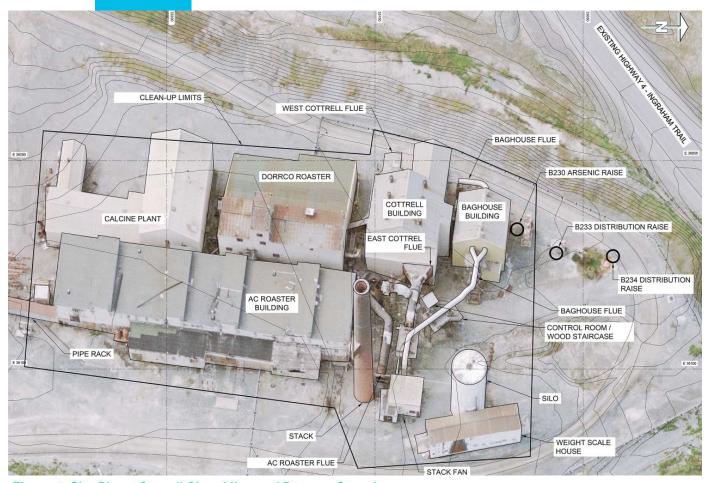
Site Plan - Overall Giant Mine and Roaster Complex
